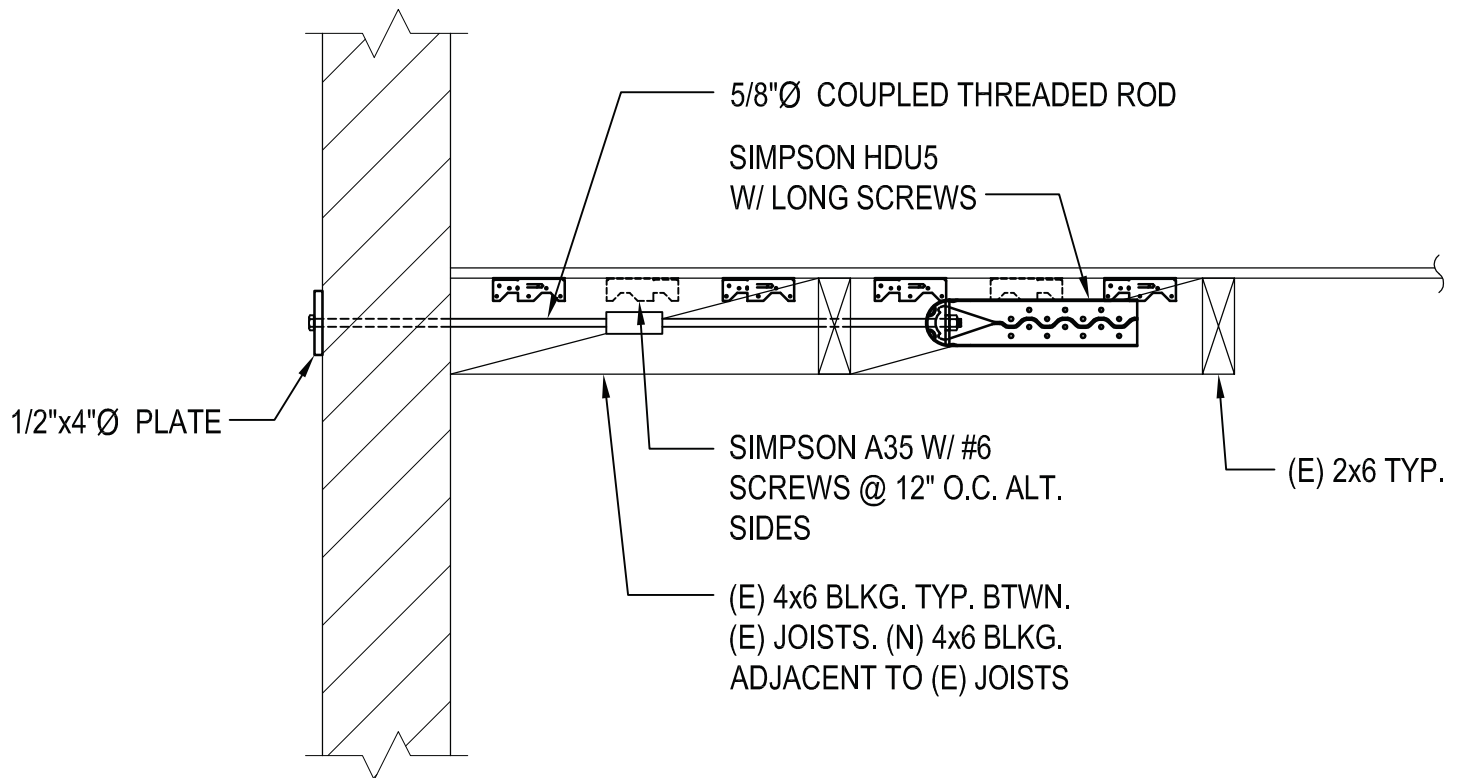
Short Wall Anchorage, Parallel to Joists
